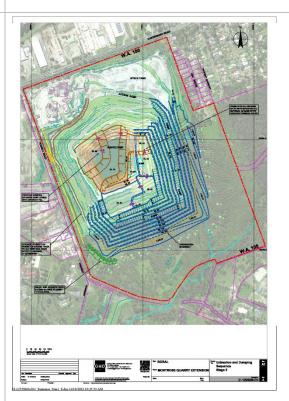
Proposed Expanded Pit – Stage 8 (source GHD)
